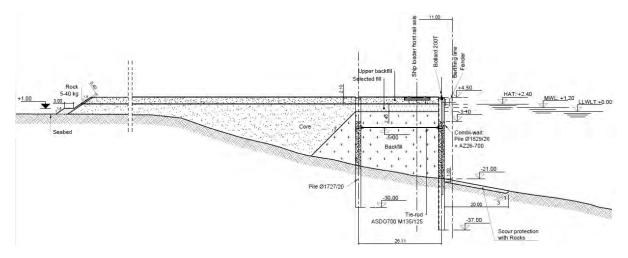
Typical quay-wall section (extract of CAN-BIM-BD-GE-DE-DW-00202 Rev00)
